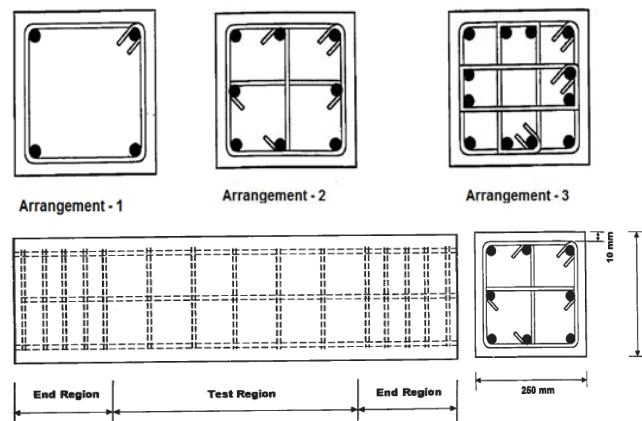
Cross-sectional arrangements and section geometry of columns [2]
